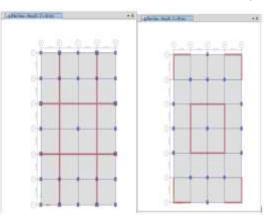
Plan View of Outrigger System & Plan View of Shear Wall System
